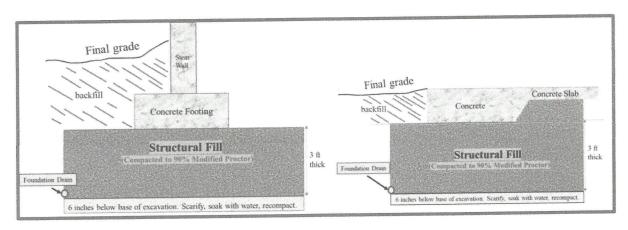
Schematic of the Foundation Designs for Surface Facilities. The Same Schematic Applies to Pads for Concrete Piers.
